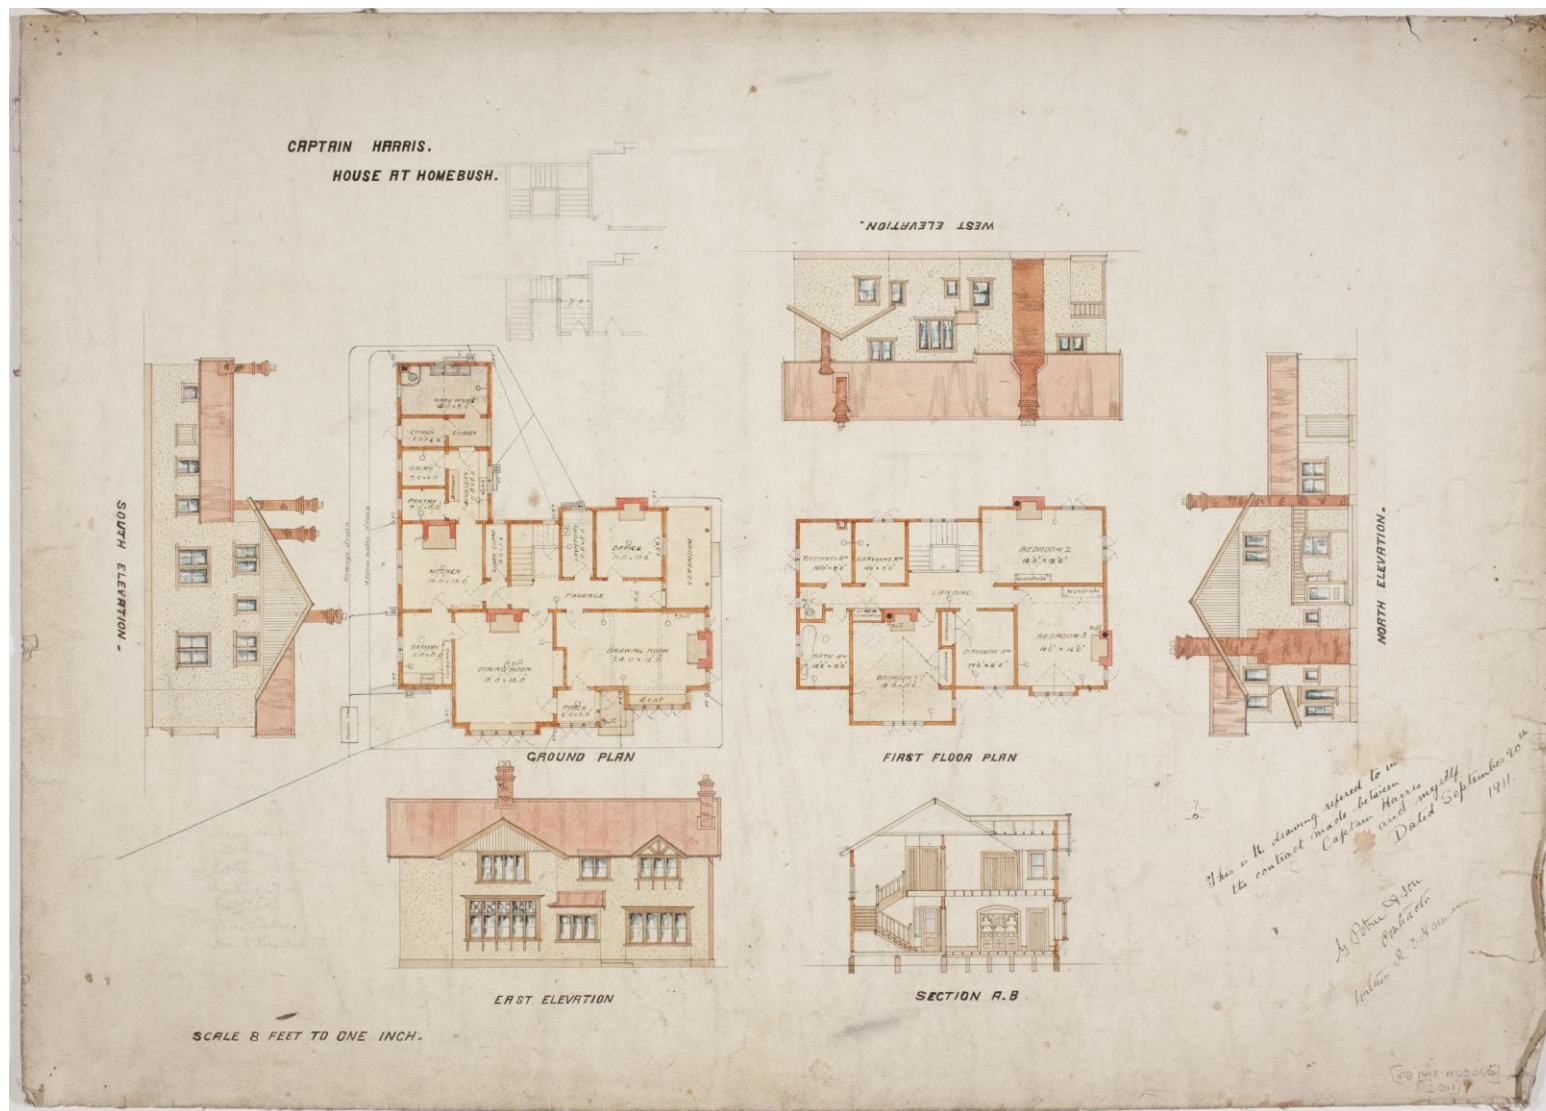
Collins and Harman, Captain Harris, House at Homebush, plans, elevations and section (1911).
